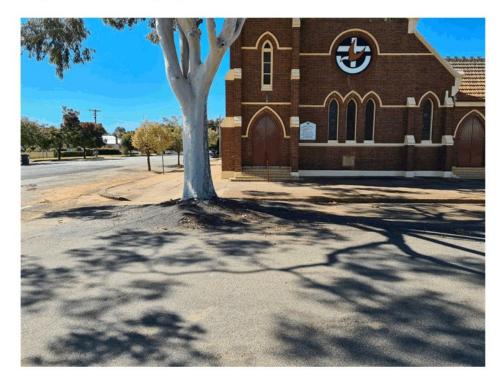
Risen and Damaged pavement due to Gum tree roots.
